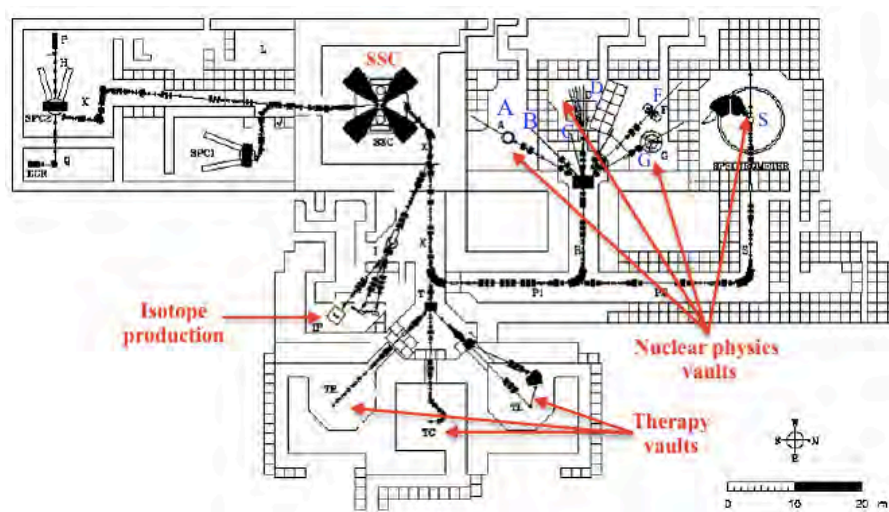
The current floor plan of iThemba LABS showing the vaults exposed to beam line.
